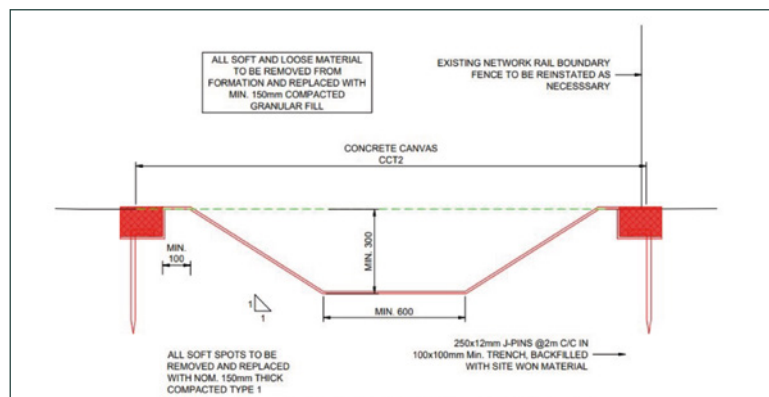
Typical section of concrete canvas lined crest ditch (extract from NR Doc. No.: 3376-MHB-REP-001).
